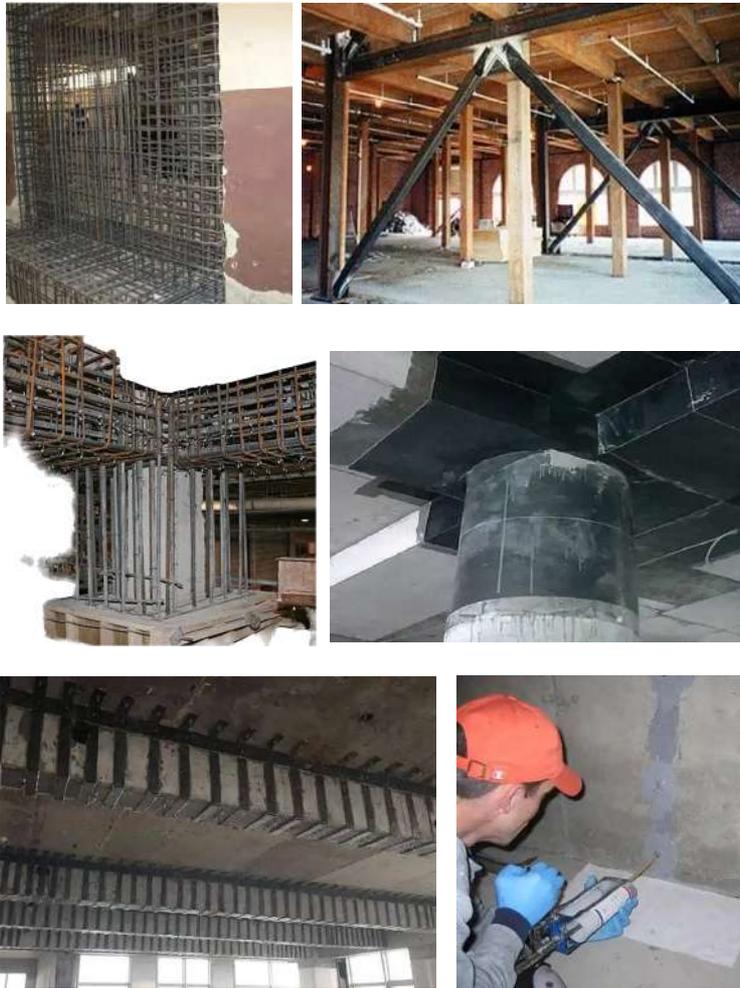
Retrofitting Solutions (Top Left to Right) Shear Wall, Steel Bracing, Section Enlarging reinforcement, (Middle Left to Right) FRP Reinforced, (Bottom Left to Right) Epoxy Injection Method, External plate Bonding
